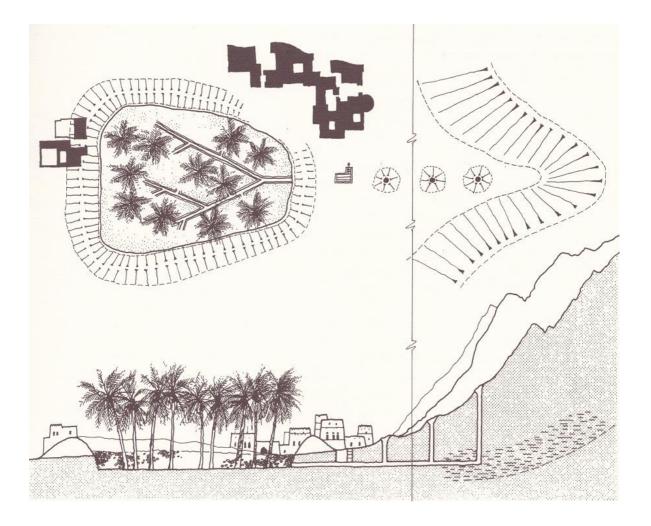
Schematic layout and section of a falaj showing the associated gardens which have been excavated down to the falaj level. Source: (Costa, 1983, p. 149).
